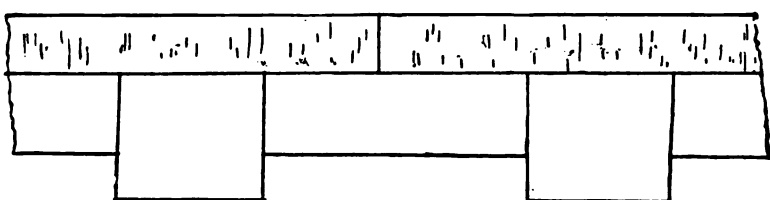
PLAN SHOWING MANNER OF LAYING GUTTER-STONES.
